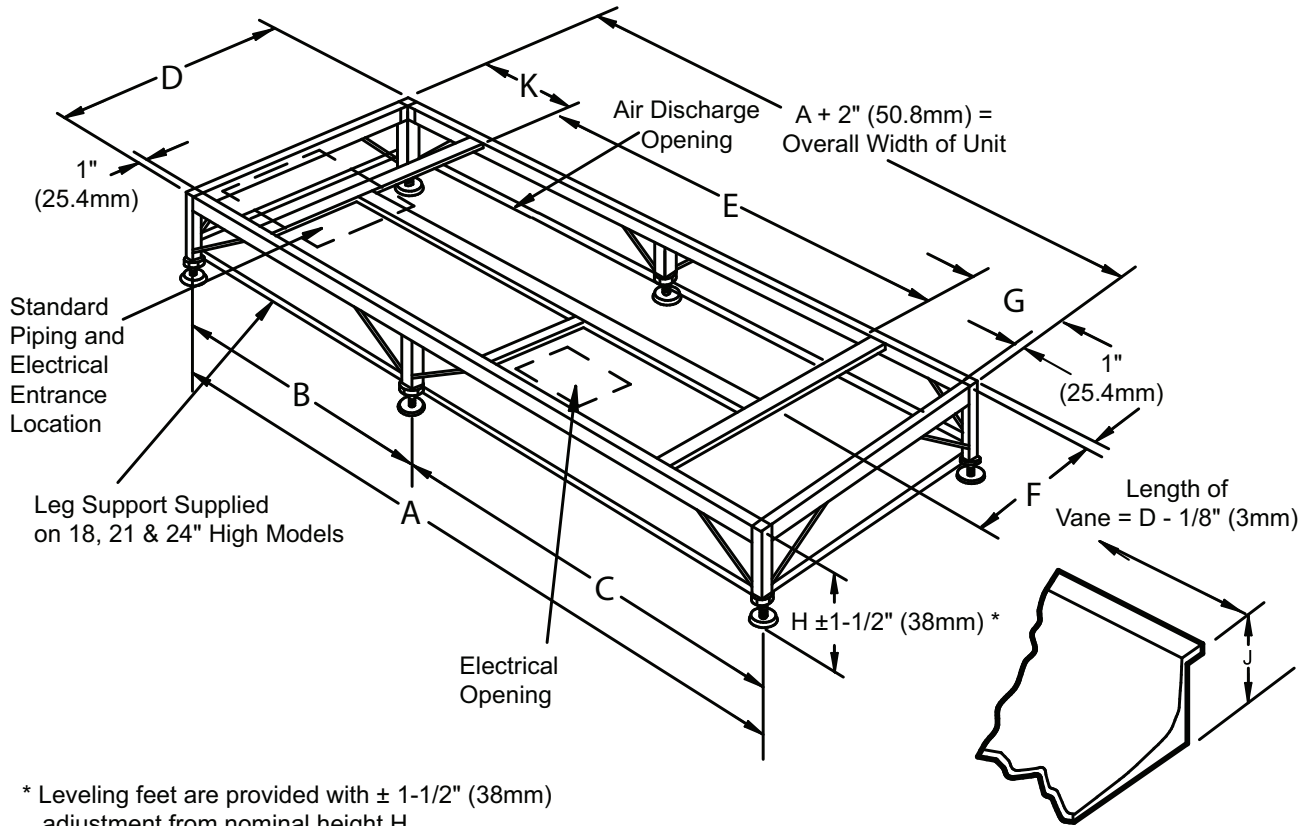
Floor stand and floor planning dimensions, CW076 and CW084 downflow models with EC fans
